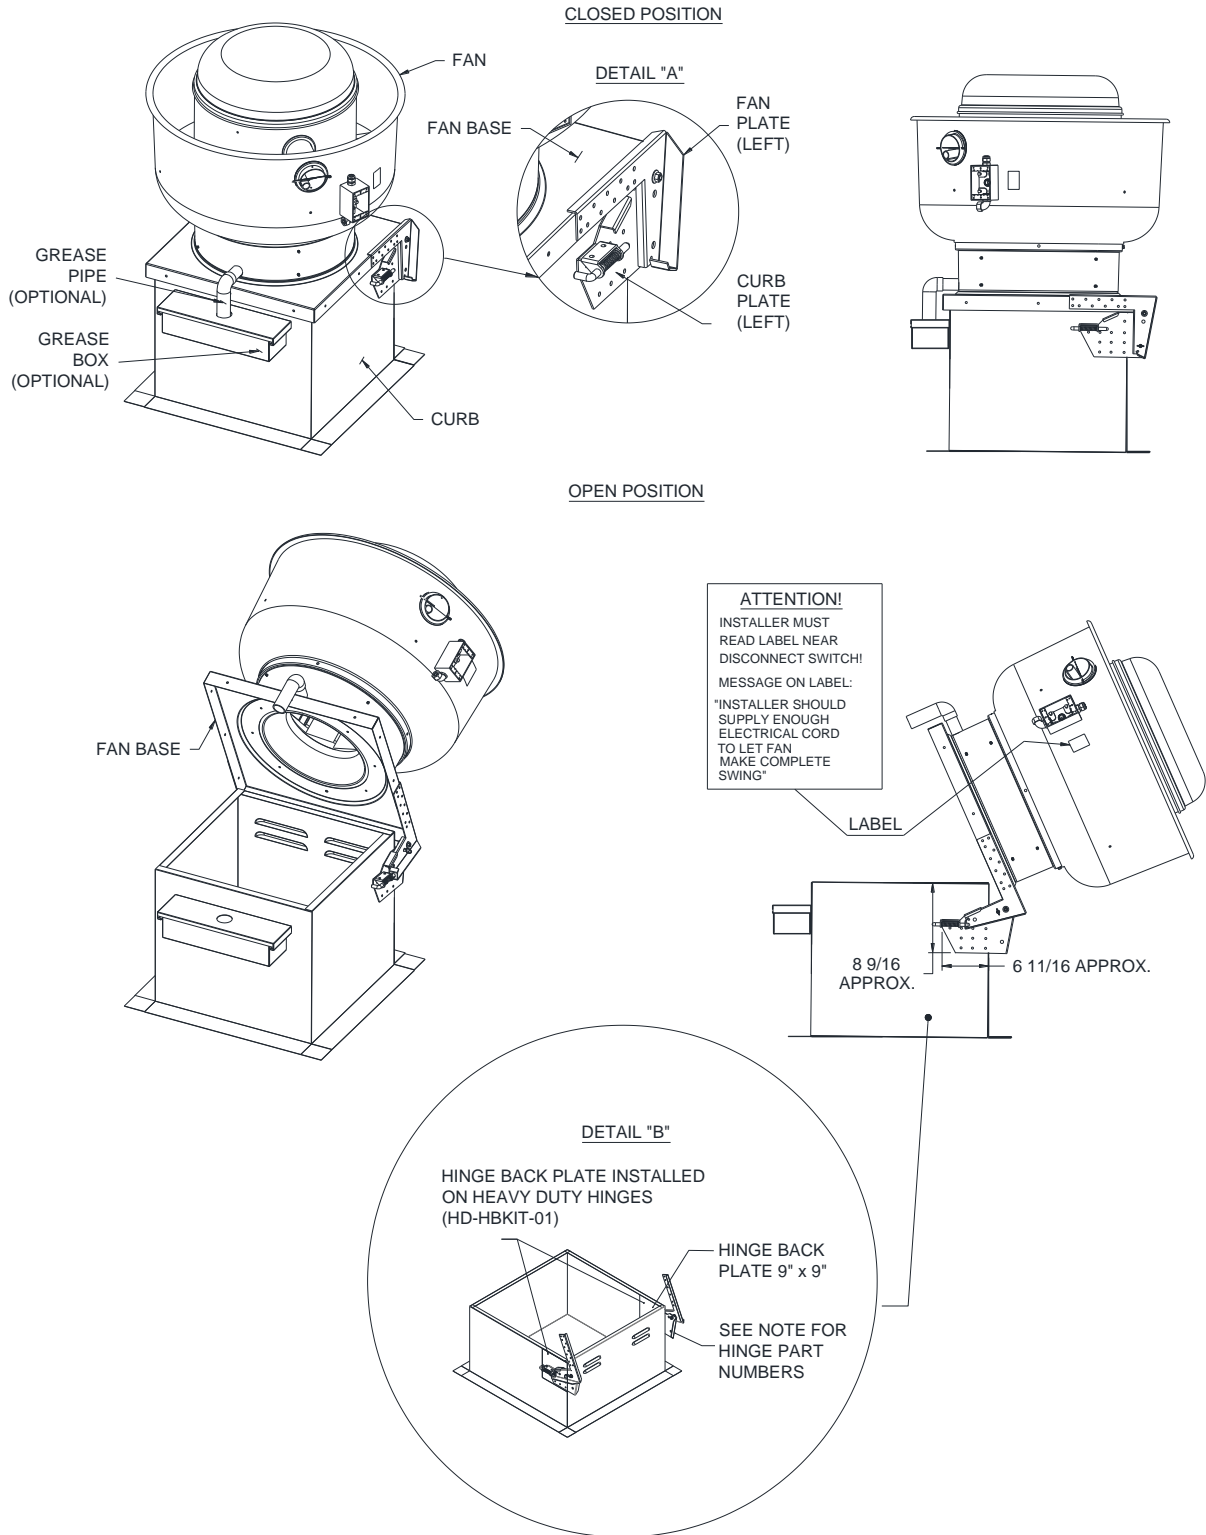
Heavy Duty (HD) Locking Hinge Kit Installation Details
